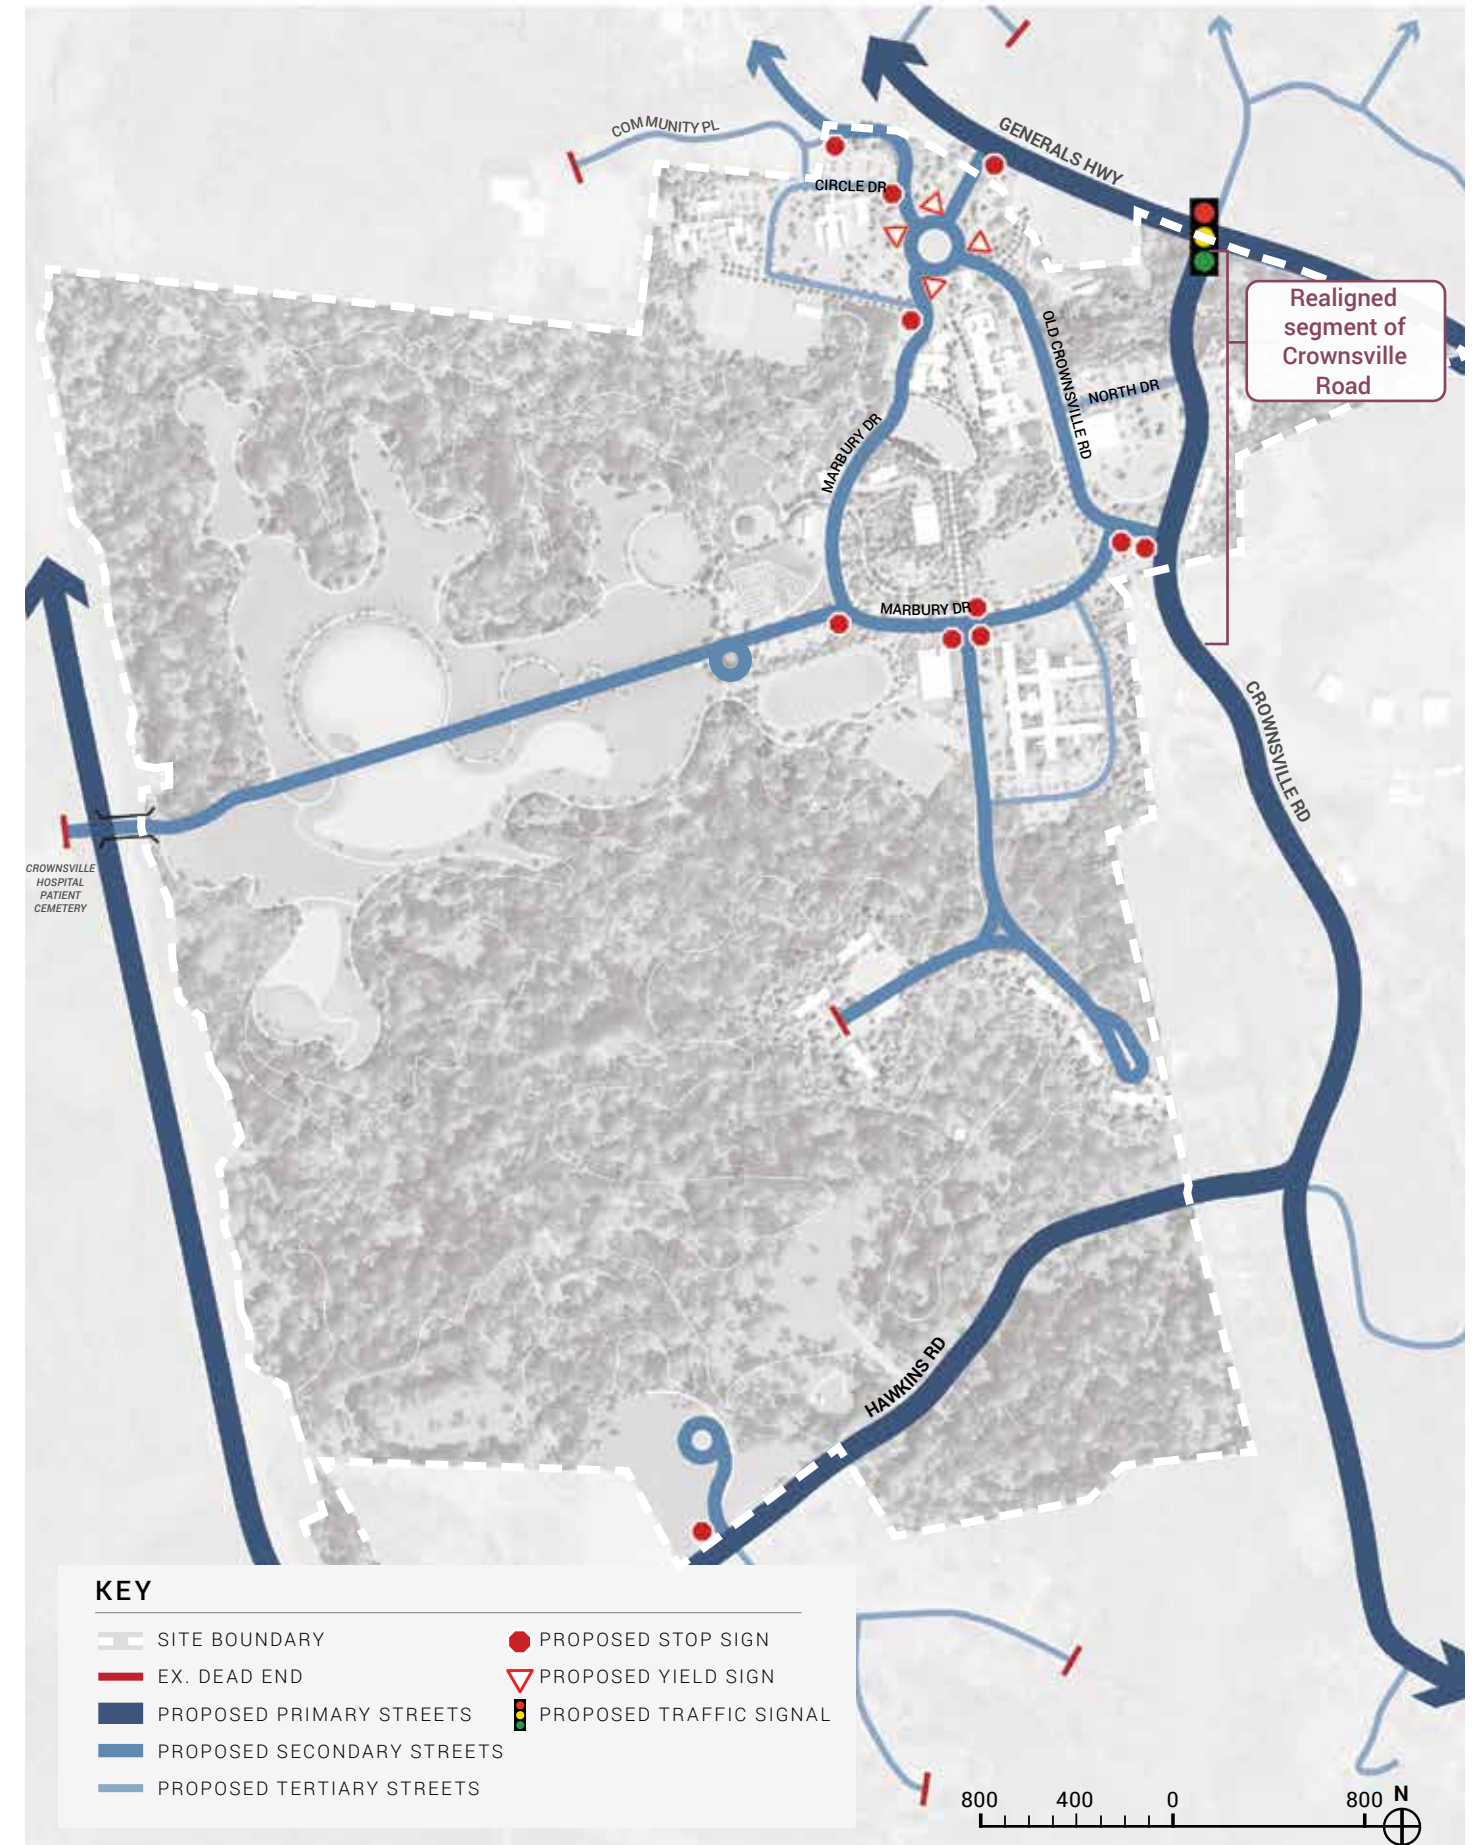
Recommended Roadway Circulation and Traffic Controls Plan | Credit: Design Collective
